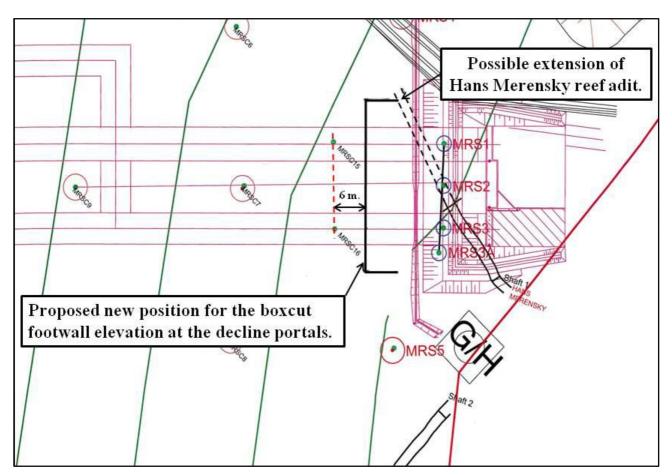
Geotechnical Proposed Boxcut Position (Spencer, 2014)
